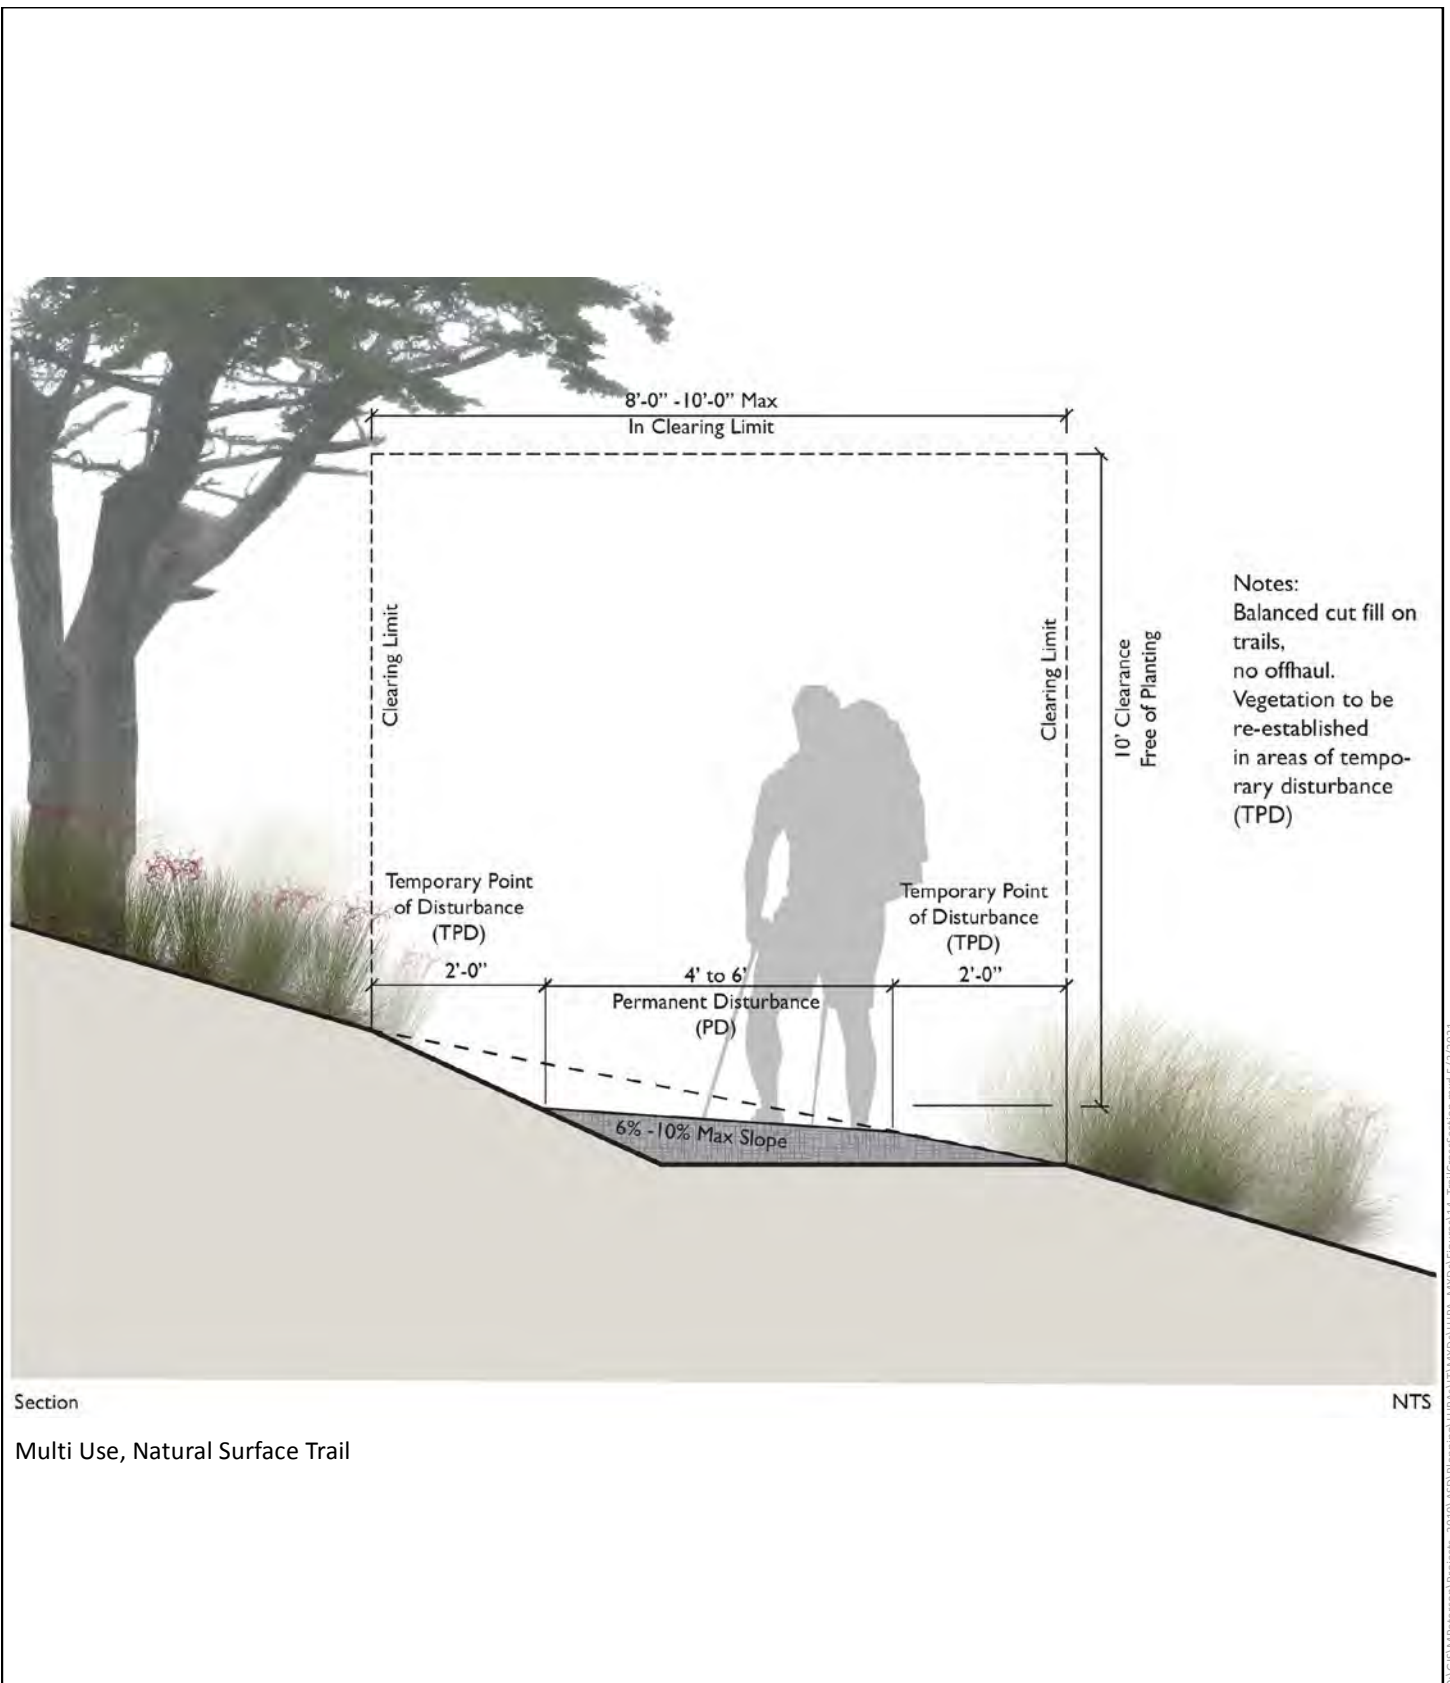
TYPICAL TRAIL CROSS SECTION
